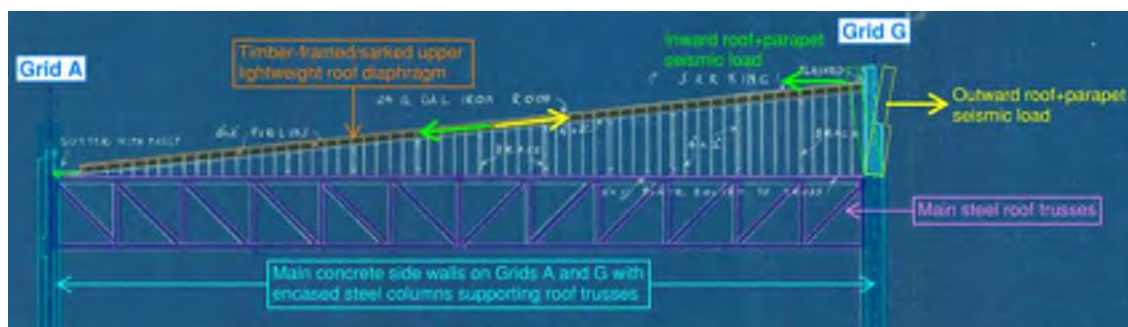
Upper roof diaphragm and parapet inwards and outwards loading cases.
